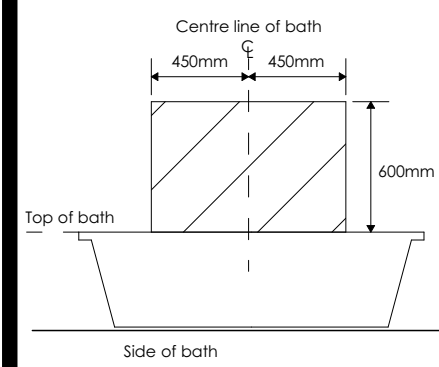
BELOW LOCATION OF NOGGINGS FOR SHOWER WALLS
